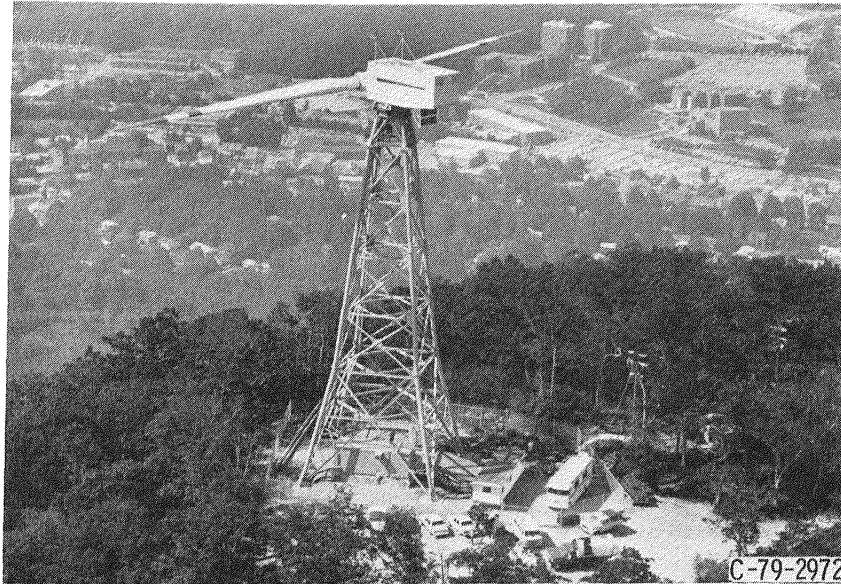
Mod-1, 2 megawatt wind turbine. Truss tower fabricated from circular pipe and standard structural steel elements.
